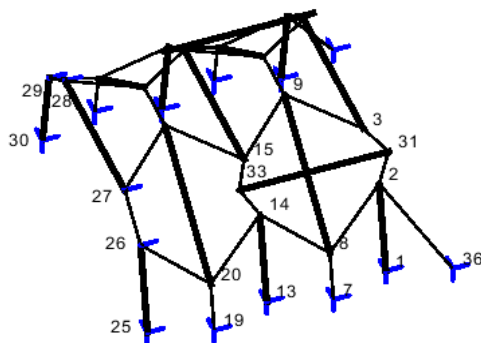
Cylindrical roof structure with longitudinal struts and additional anchorage cables
